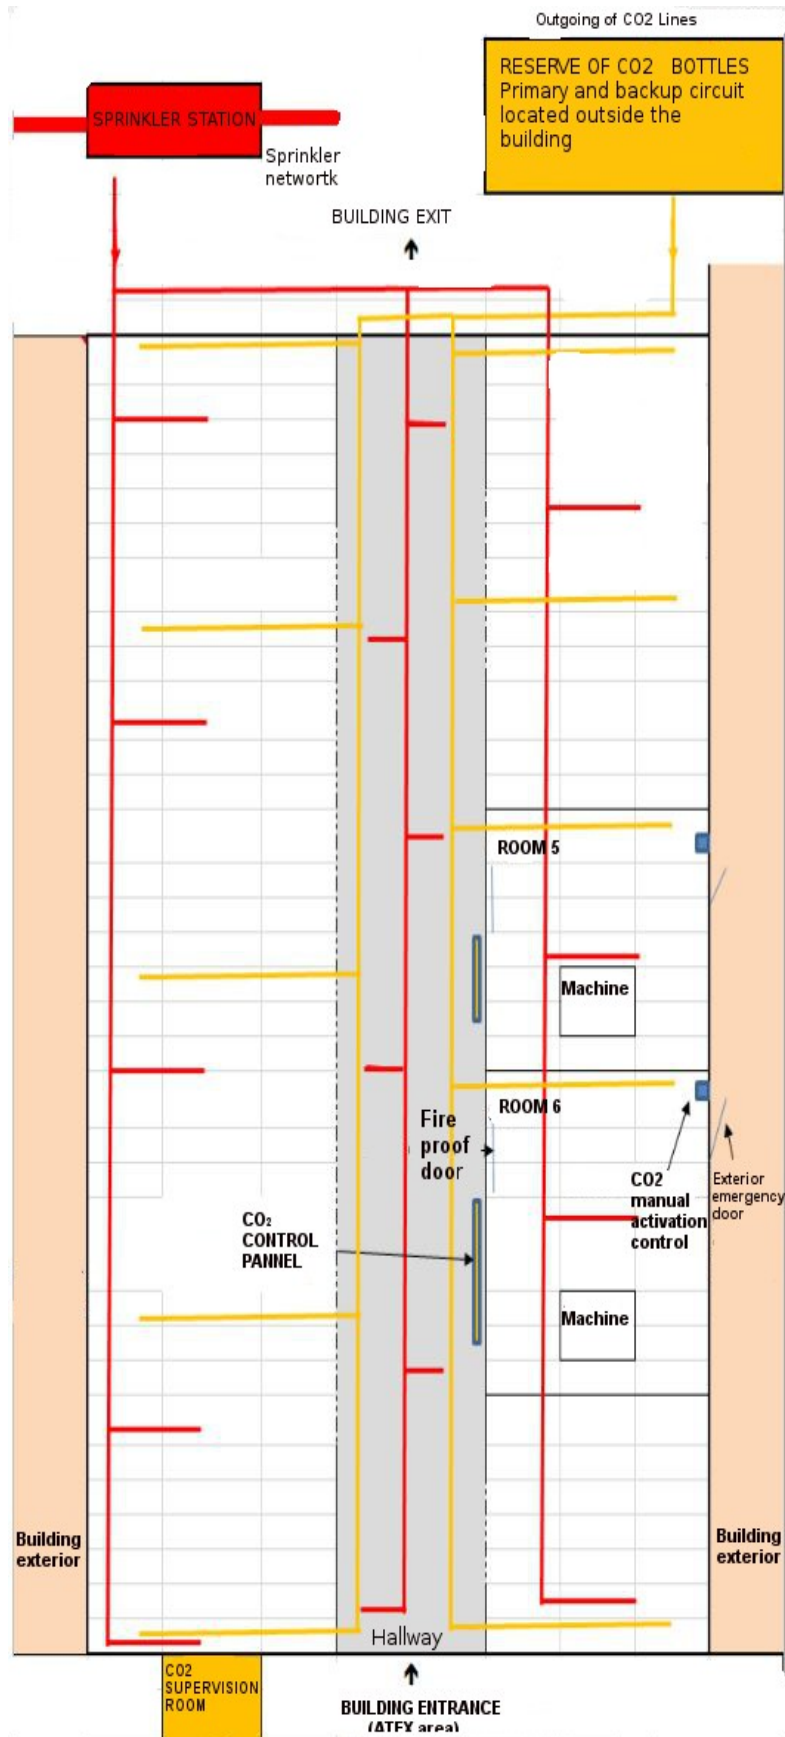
Fire protection devices inside the adhesive workshop building (source: DREAL NPDC)
